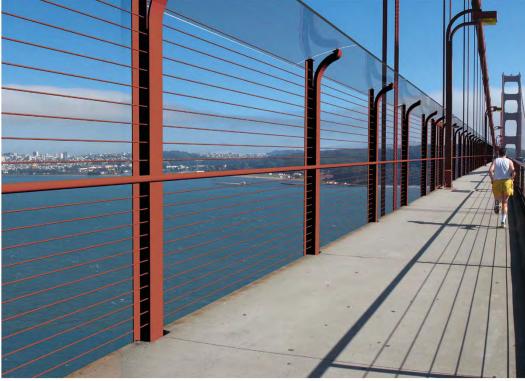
VIEWPOINT 12: SIDEWALK VIEW NORTH - ALTERNATIVE 2B
